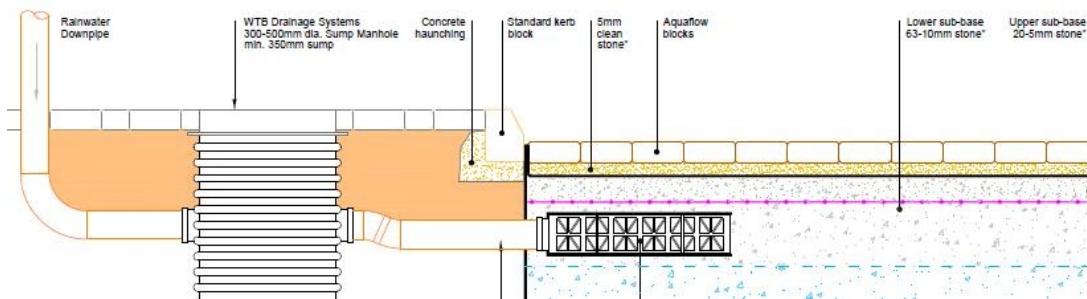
Typical Permeable Paving Detail (c: Roadstone)
